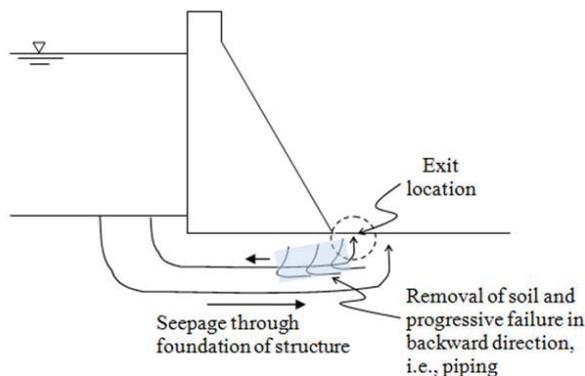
(a) Seepage through the foundation of a water retaining structure and phenomenon of piping in dams
